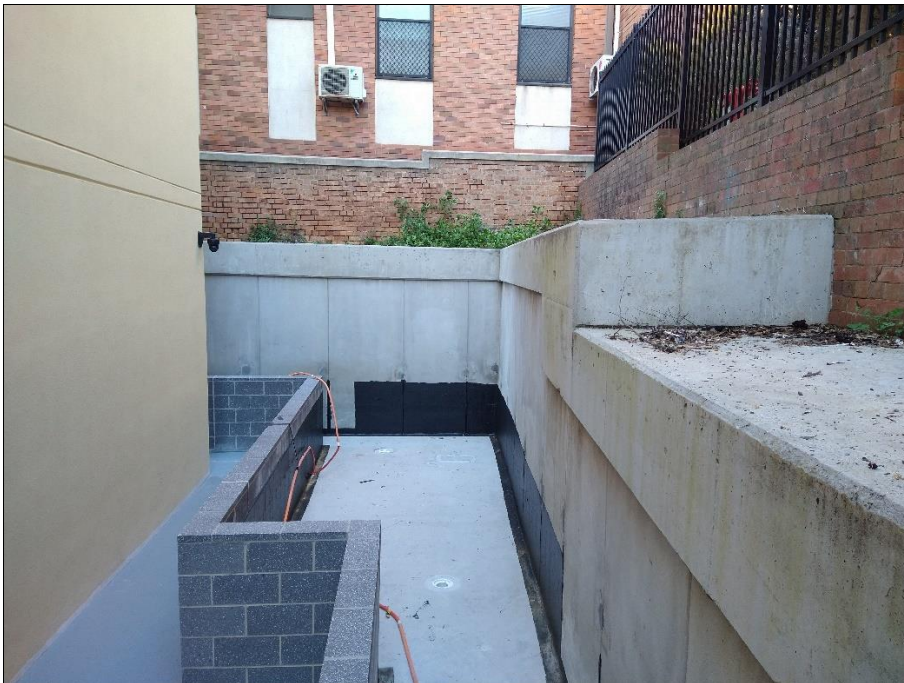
Concrete footpath (capping) and garden beds over concrete to western side of Education Building (13 July 2021)
